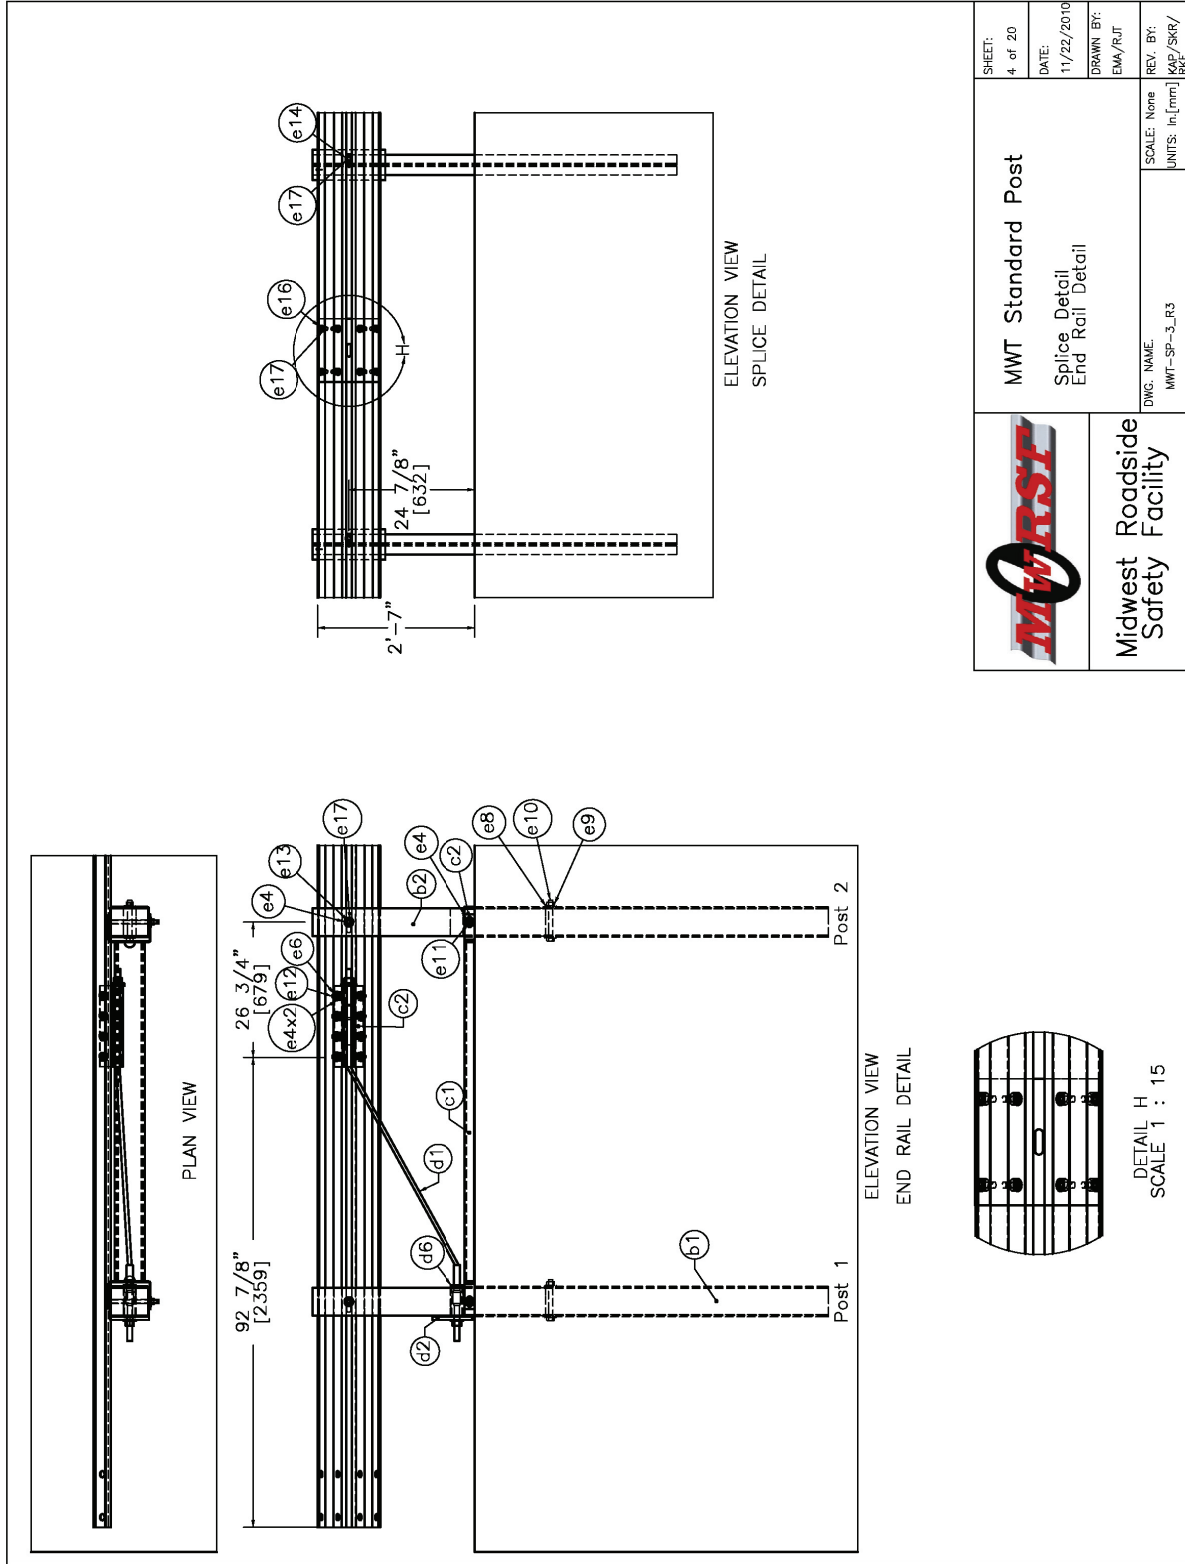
Splice and End Rail Details, Test Nos. MWTSP-1 through 3
